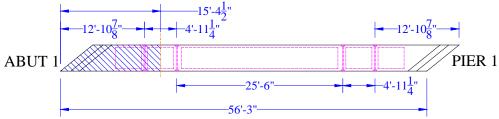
Plan View of Span 1 Beam 7 of Lakeview Drive Bridge
